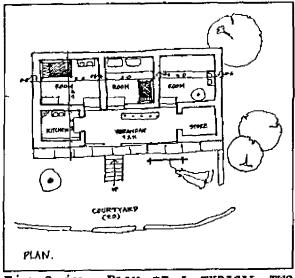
iv Plan of a Typical Two storey house in Garhwal
